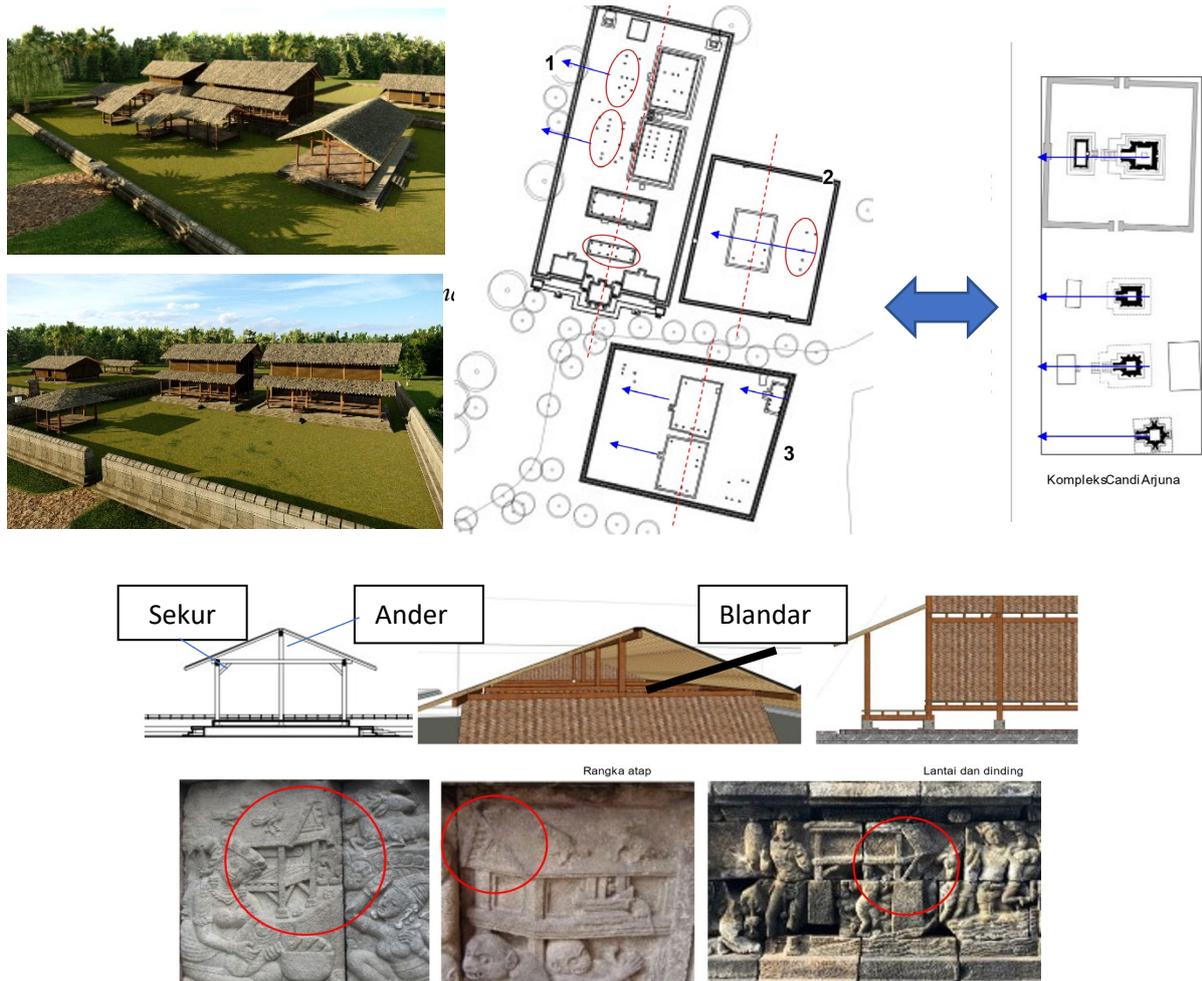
The Tectonic of Roof Construction, *Blandar*, *Ander*, *Sekur*[24]
